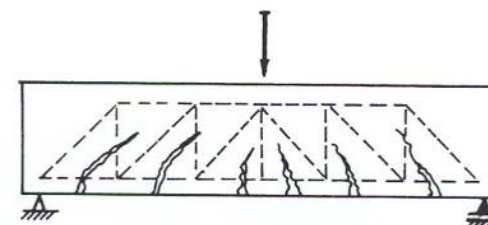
Typical shear failure in prestressed beams without web reinforcement.
